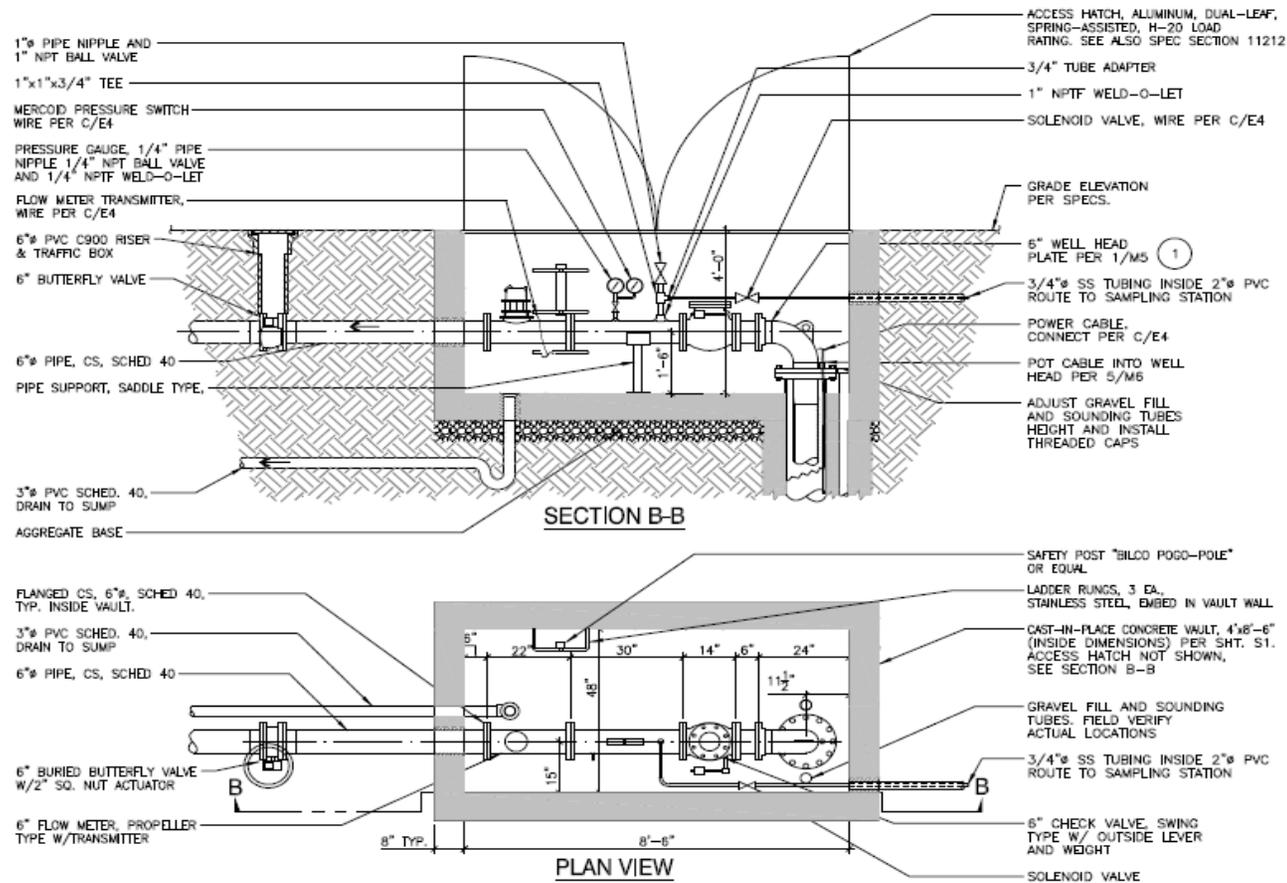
SECTION AND PLAN VIEWS, WELLS 4645 AND 4655
